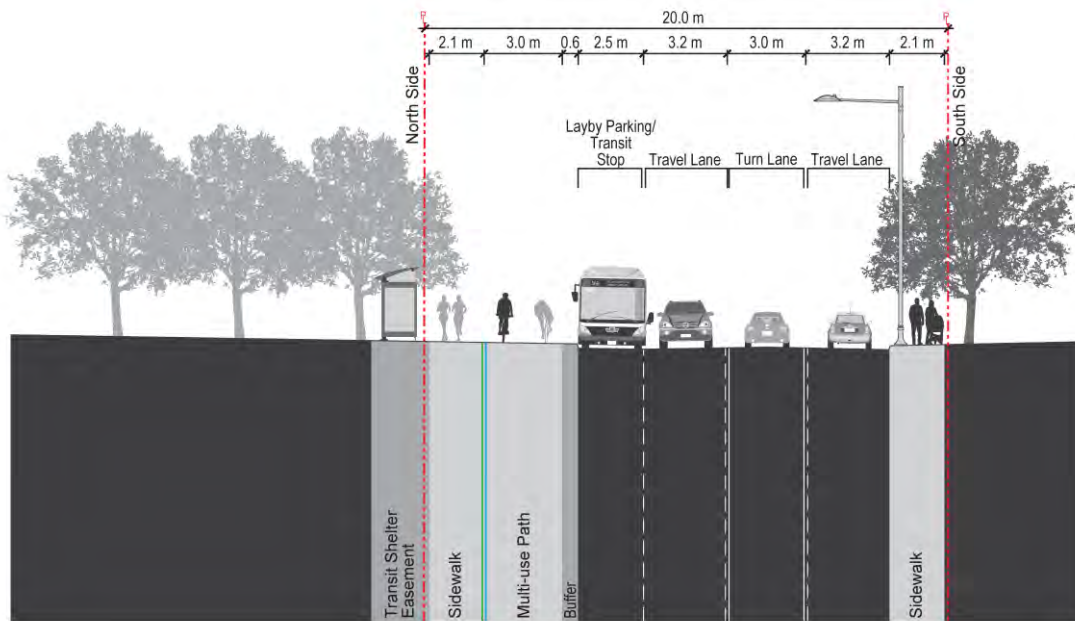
Vanderhoof Avenue Typical Section with Layby Adjacent to Public Park
